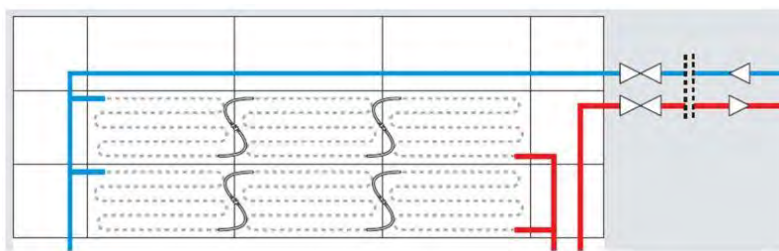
Hydraulic scheme of the suspended ceiling [7]
